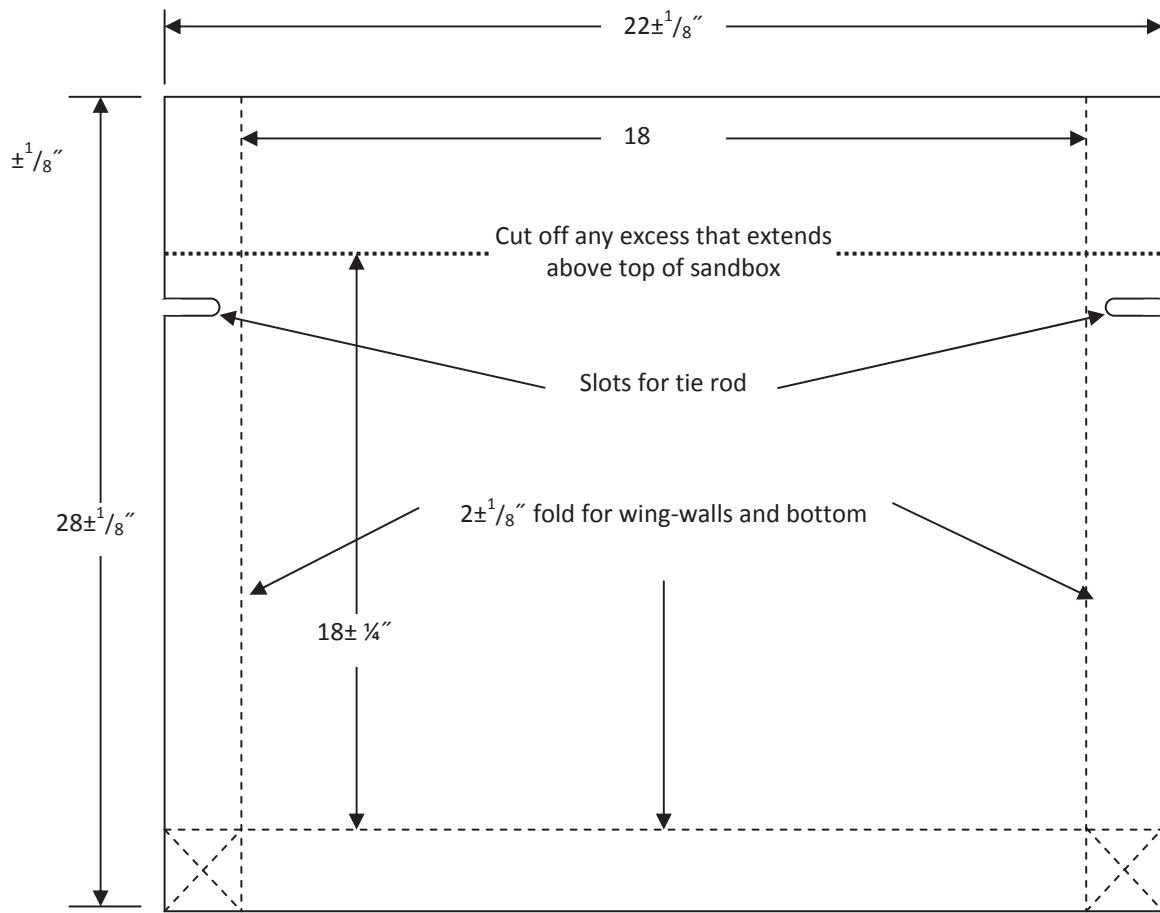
Dimensions of the posterboard wall facing (not to scale)
